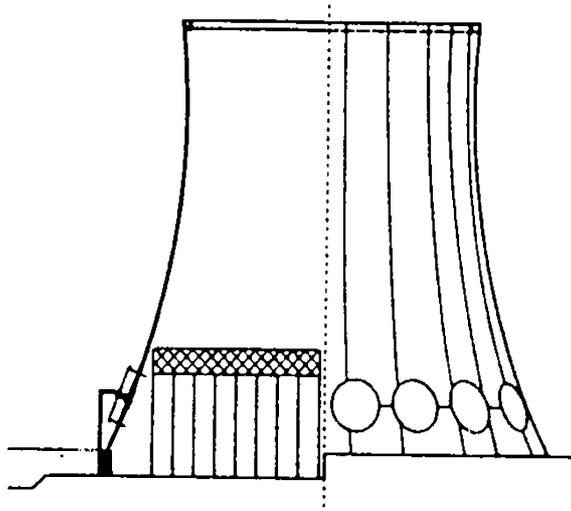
Mechanical draught cooling tower (pressure fans)
